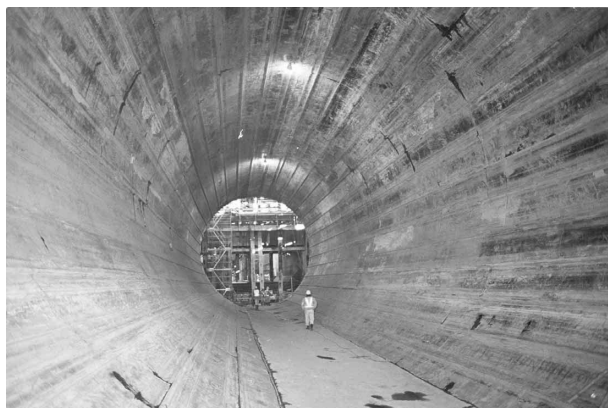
Jointed element structure-shaped steel (Jointed element structure method)
